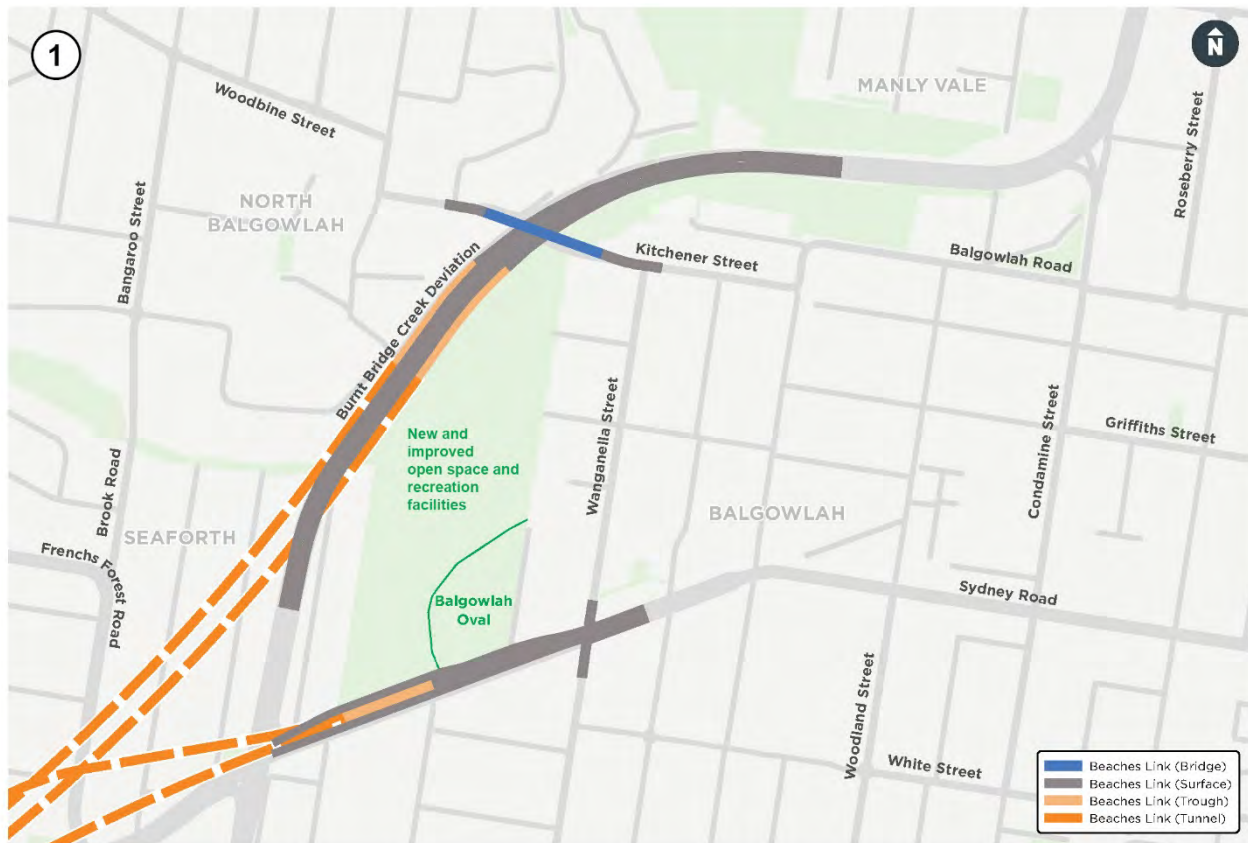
Alternative 1 – Ramps emerging in Sydney Road
